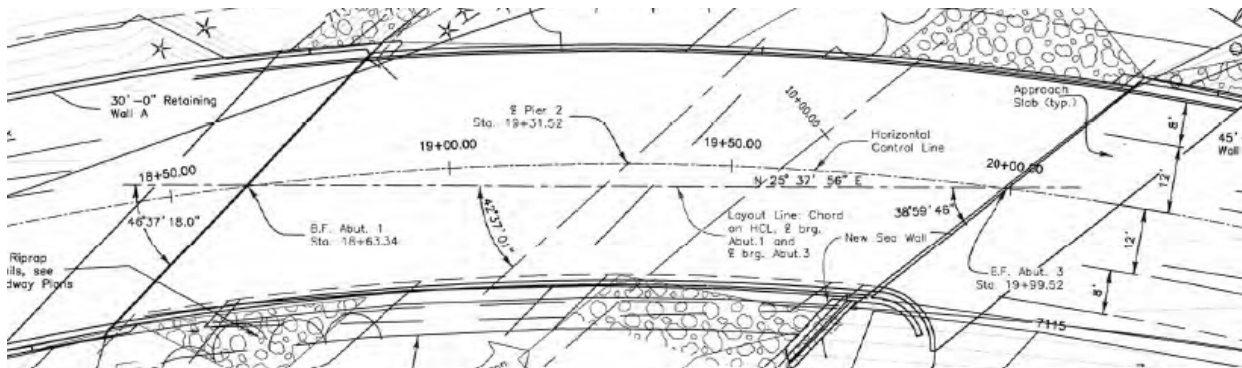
Plan view of the bridge deck of C-15-O (CDOT see Appendix A)
